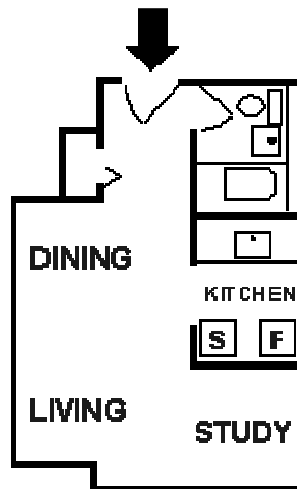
Floor plan of studio/bachelor apartment at YU⁸⁴
